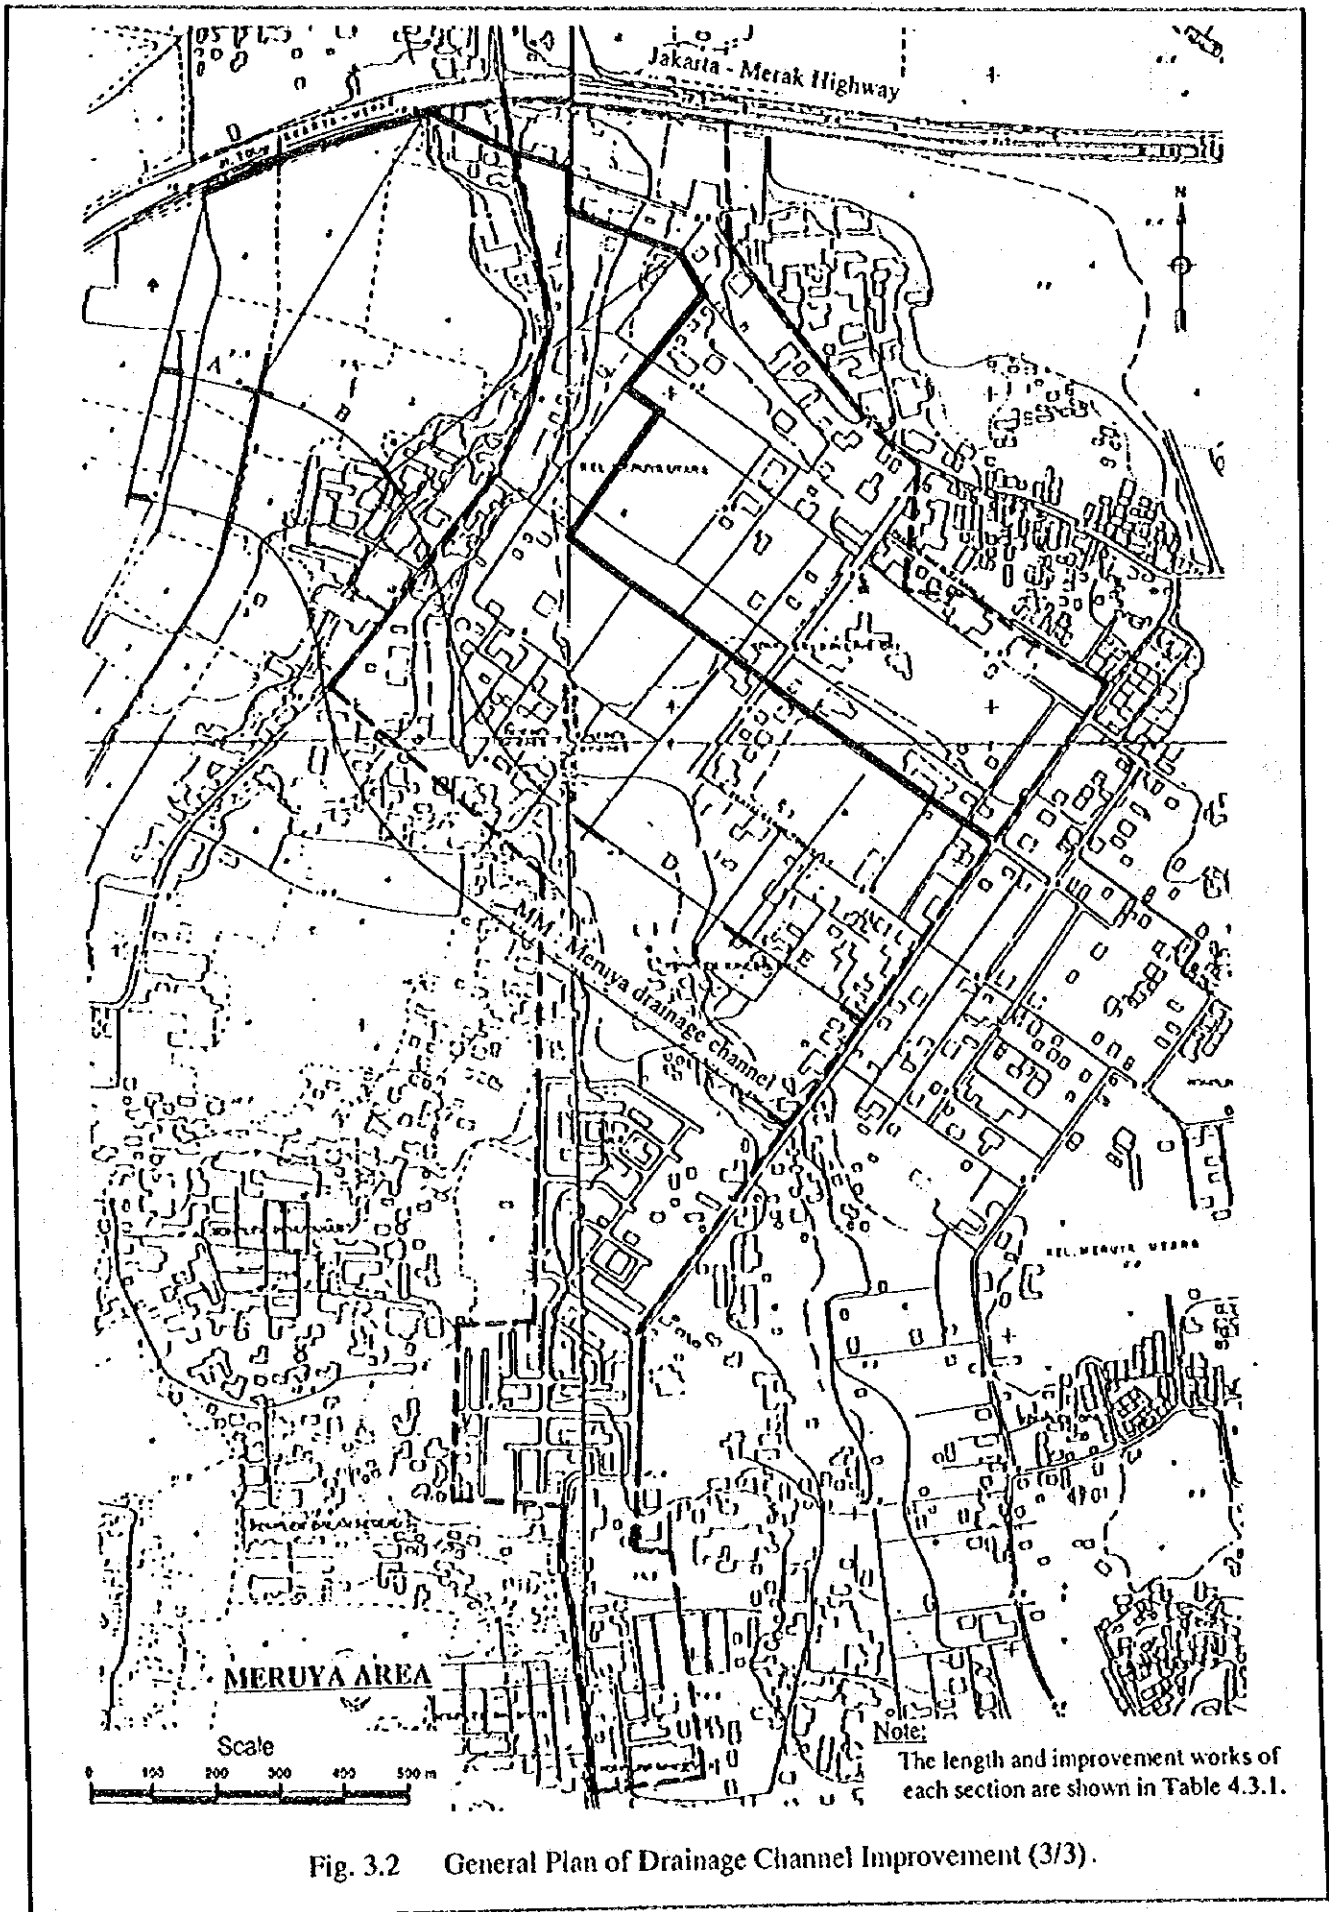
General Plan of Drainage Channel Improvement (3/3).
